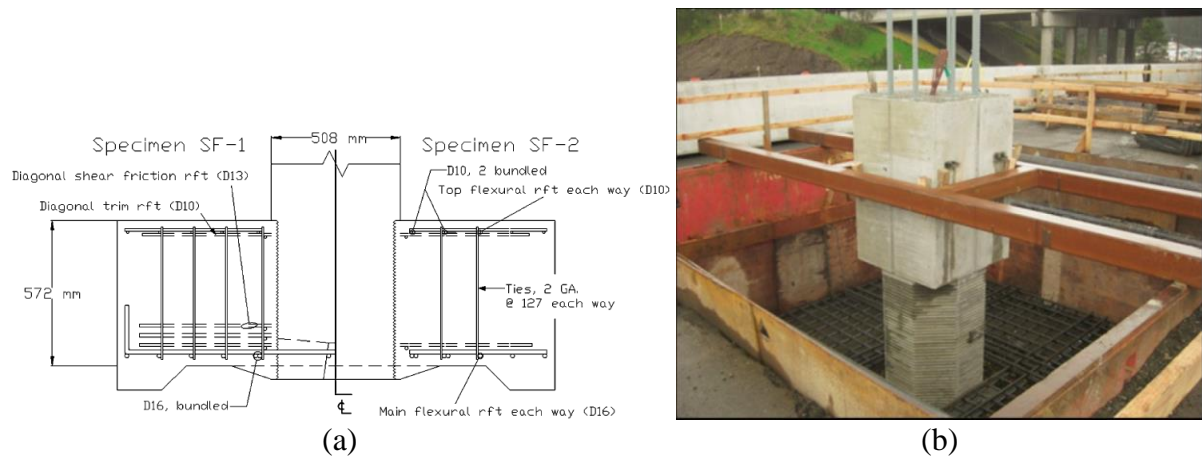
Socket connections with CIP footings: (a) test specimen and (b) implementation over I-5 in Washington State
